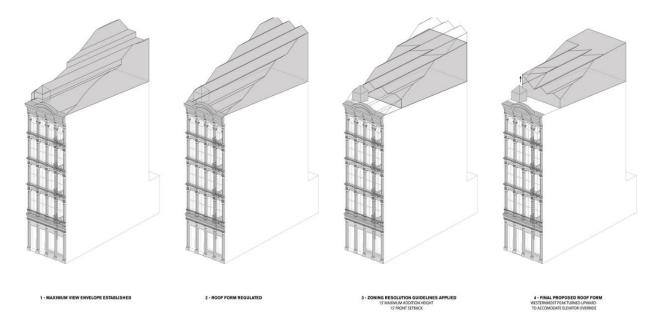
Roof evolution of the stealth building (Source: work.ac/work/stealth-building)
